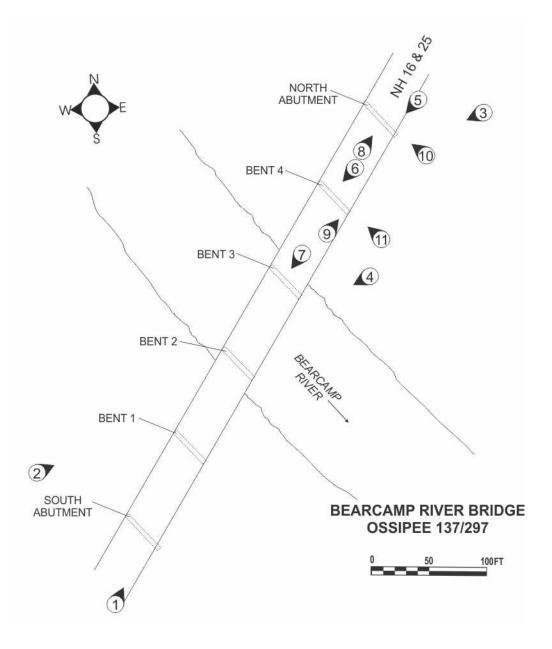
Bearcamp River Relief Bridge, Site Sketch
